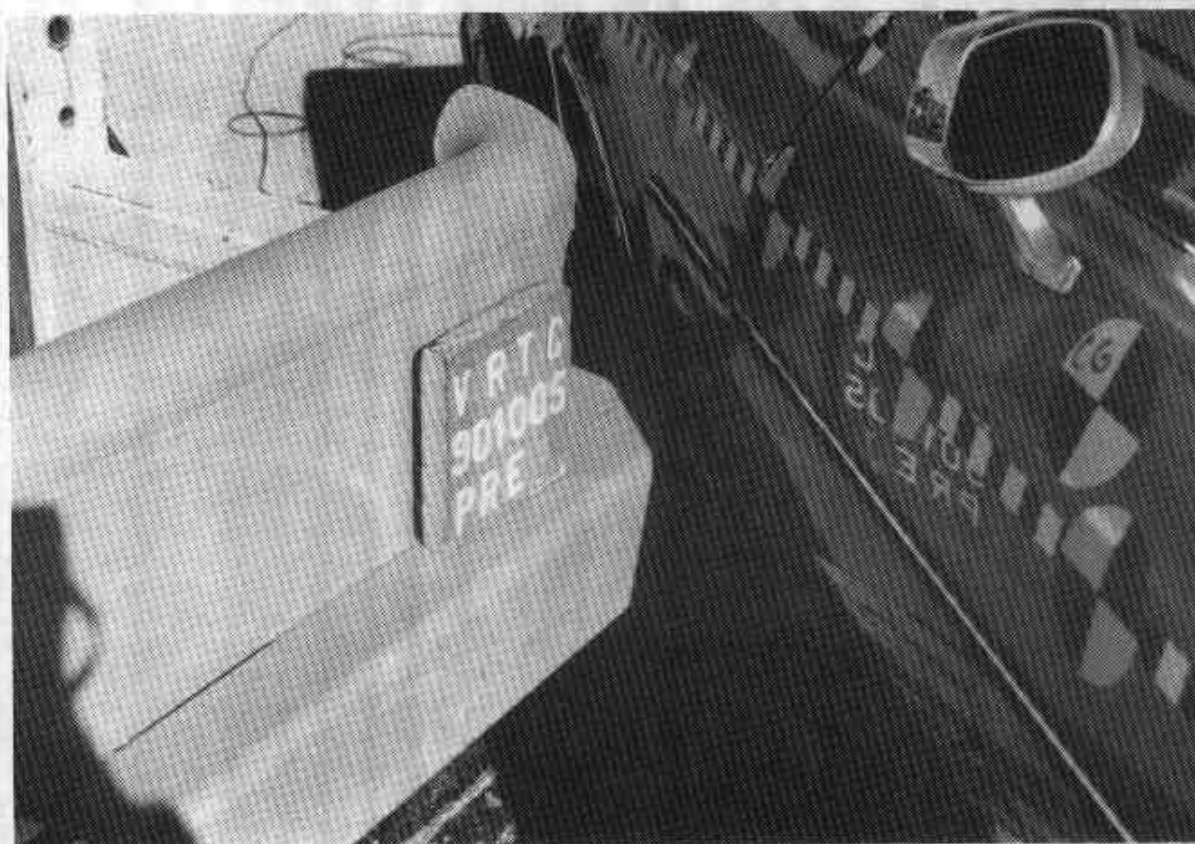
PRE-TEST LEFT SIDE CLOSE-UP VIEW
